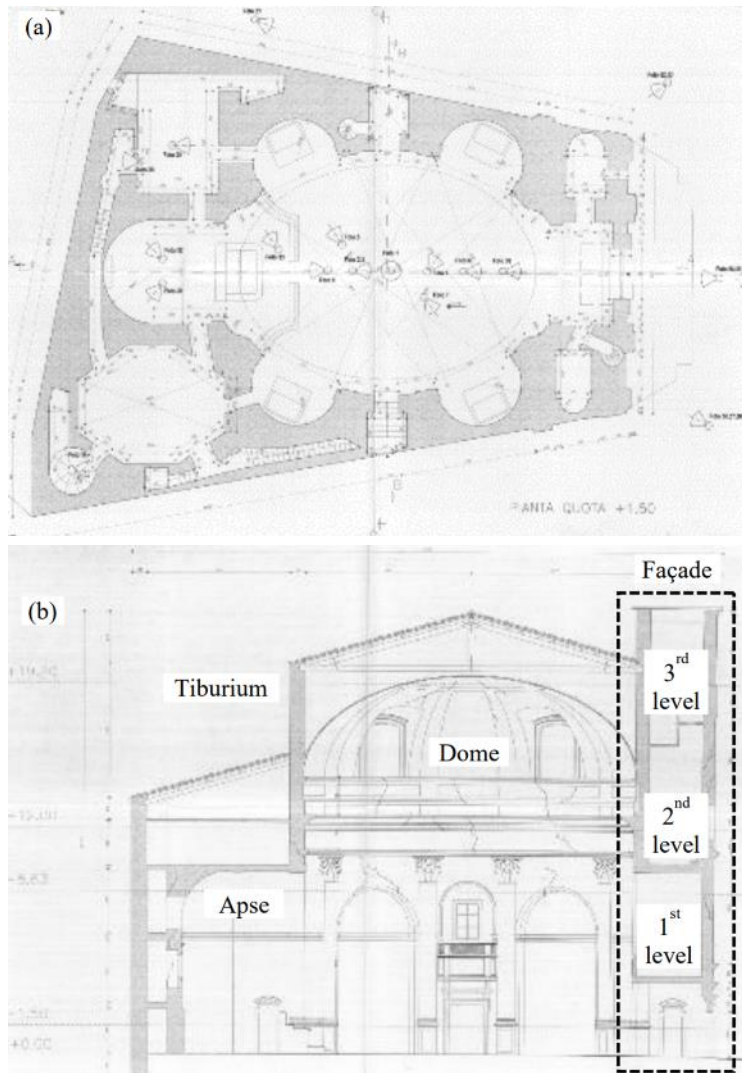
Santa Maria in Via church a) planimetric scheme; b) longitudinal cross-section.
